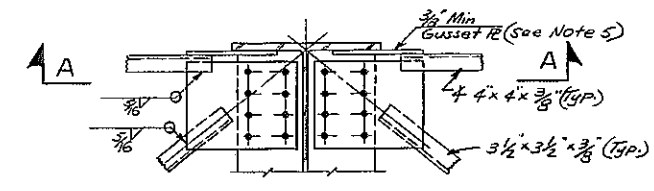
DETAIL SHOWING METHOD OF CONNECTING GUSSET PLATE AFTER STIFFENER AND/OR CONNECTION PLATE ATTACHMENT
